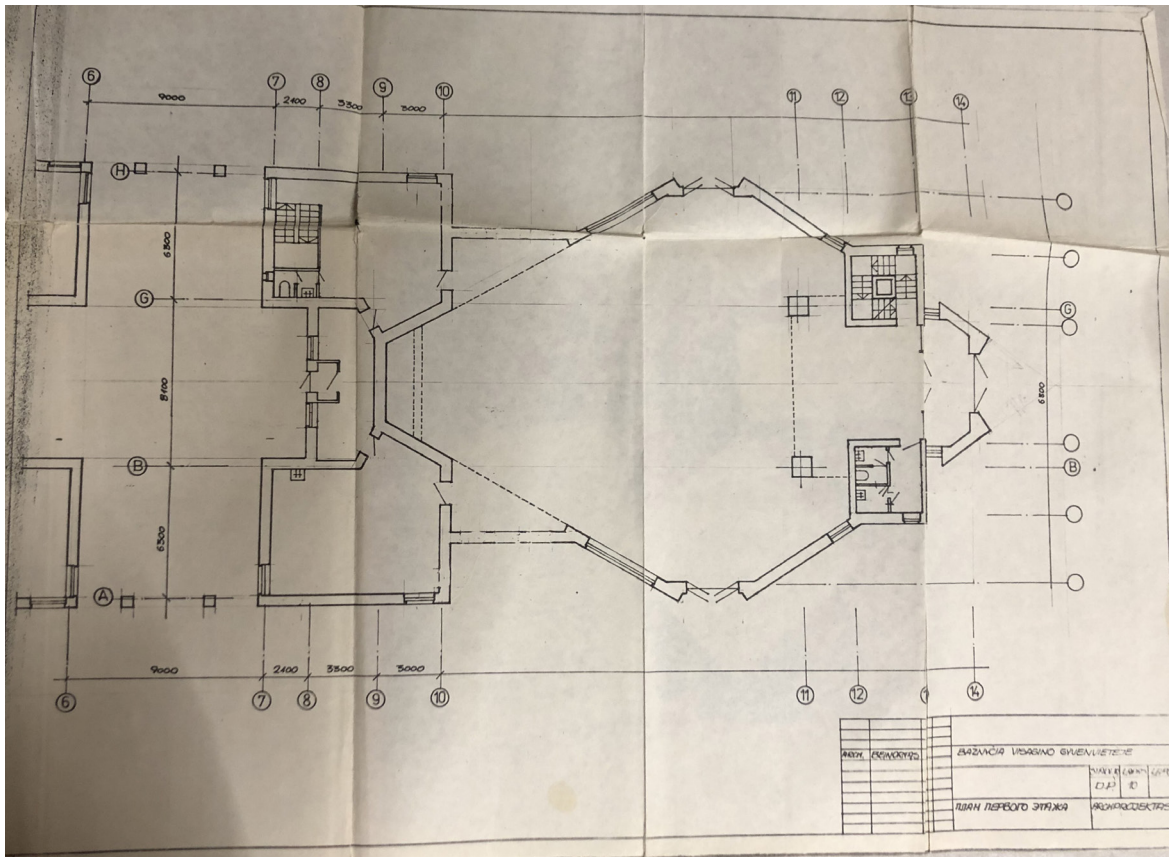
Ground floor plan of Visaginas St. Paul Church. Author Ramūnas Beinortas, 1990.
